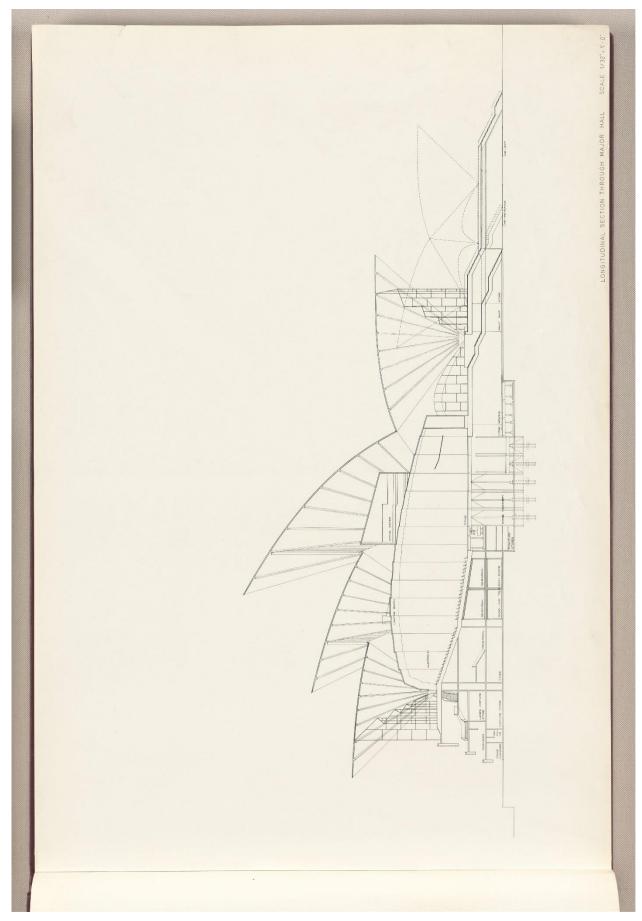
Sydney Opera House – Longitudinal Section through Major Hall
